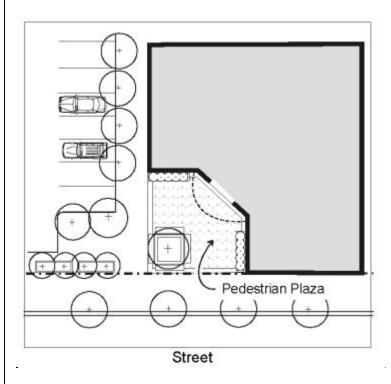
(C)(4): Example of a pedestrian plaza connection between the street and the building.
